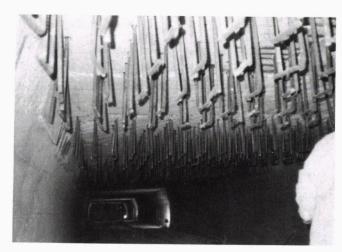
Dowels ready to connect new anchor blocks to existing p.c. box deck.
